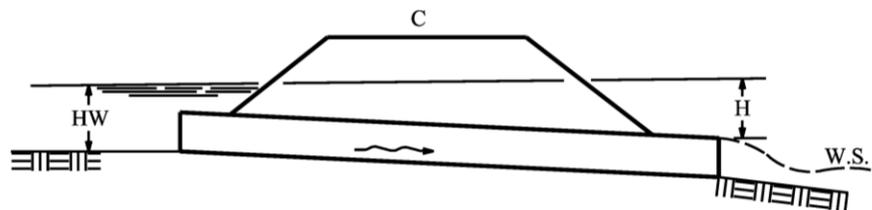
E-2.02B: Outlet Submerged, Inlet Unsubmerged
